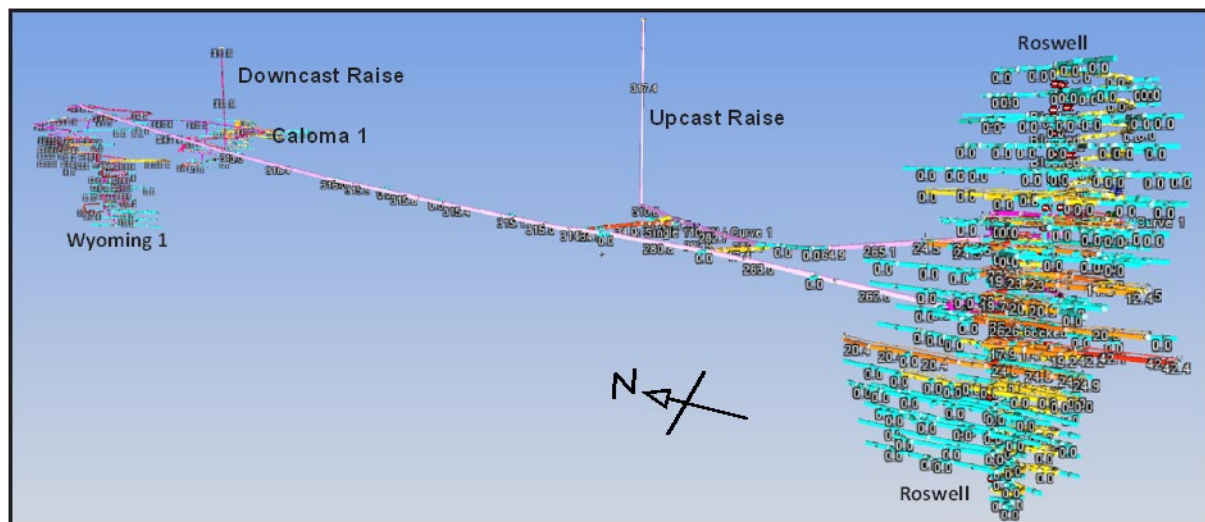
Mine Layout and Ventilation—Wyoming, Caloma and Roswell
